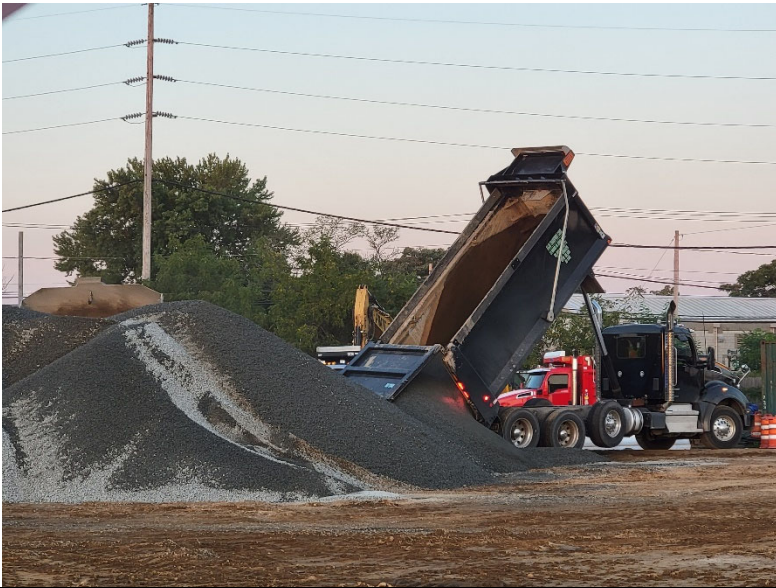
Looking northwest, truck unloads #4 stone before Pratt cleans truck wheels exiting the site prior to tracking pads for dust mitigation and sediment track out control.
